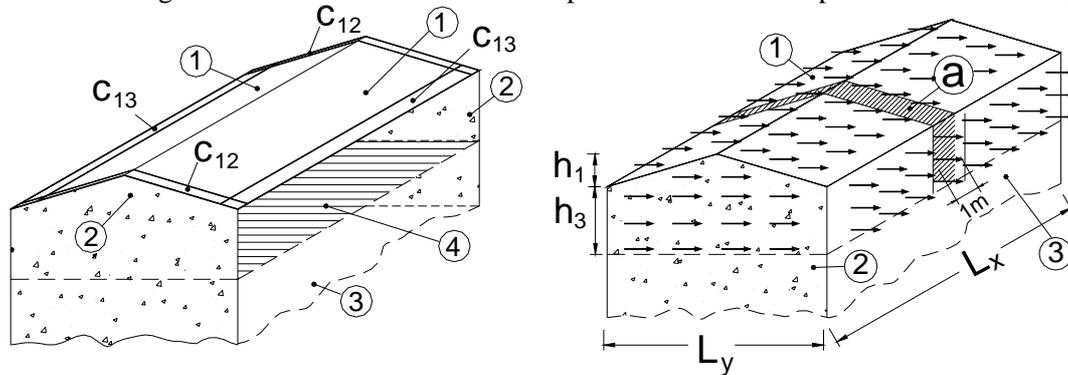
(a) Structural elements for the wooden roof strengthening; (b) seismic action distribution.
